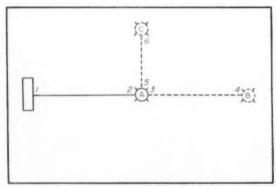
EACH OUTLET IS CHARGED with two conduit entrances. The one at the fuse center is charged to outlet "A". Each additional outlet installed involves two more.
